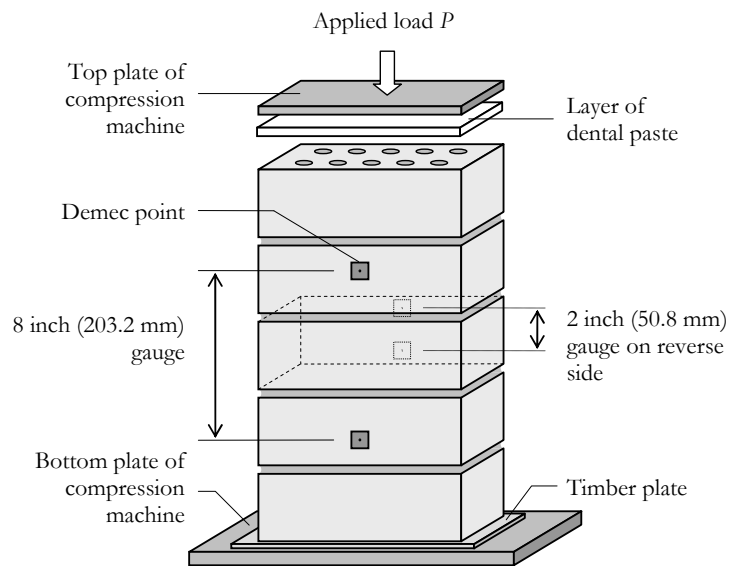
Compression test arrangement used for full-sized brick specimens.
